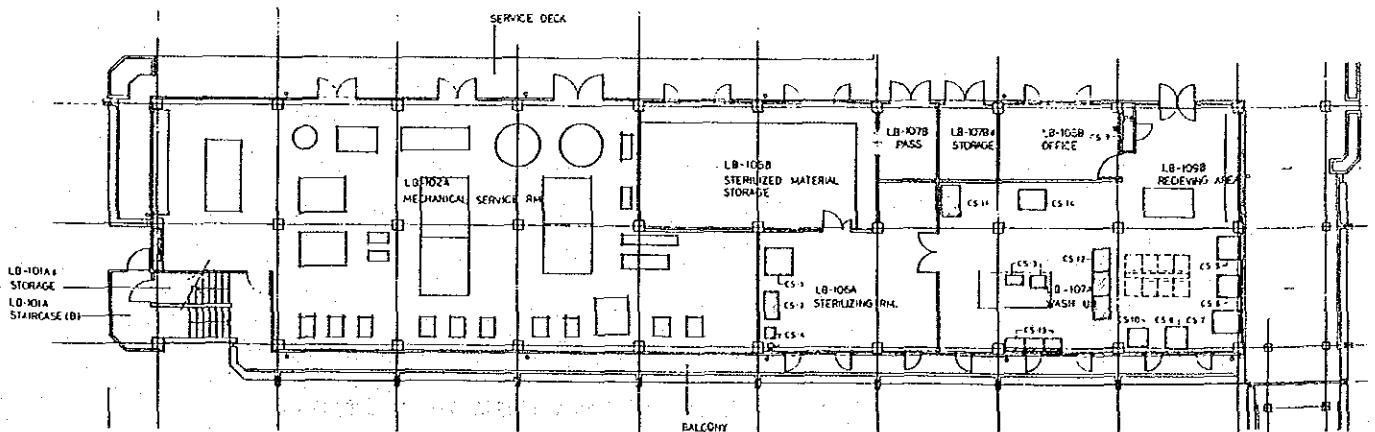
PLANNING OF FIRST FLOOR, WING A
